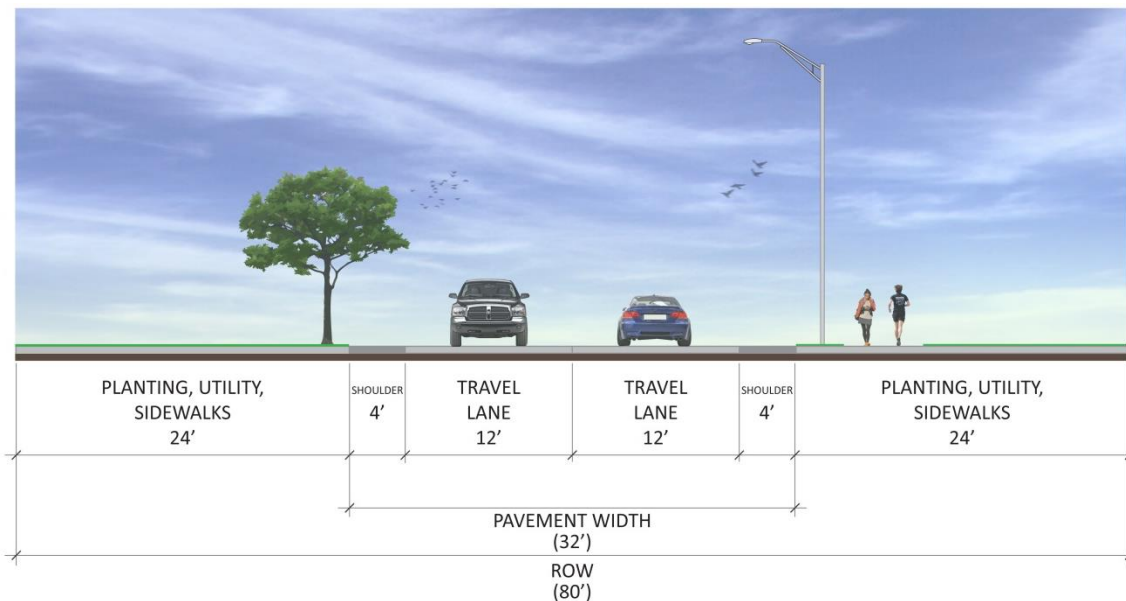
Proposed Rural Arterial Cross-Section
